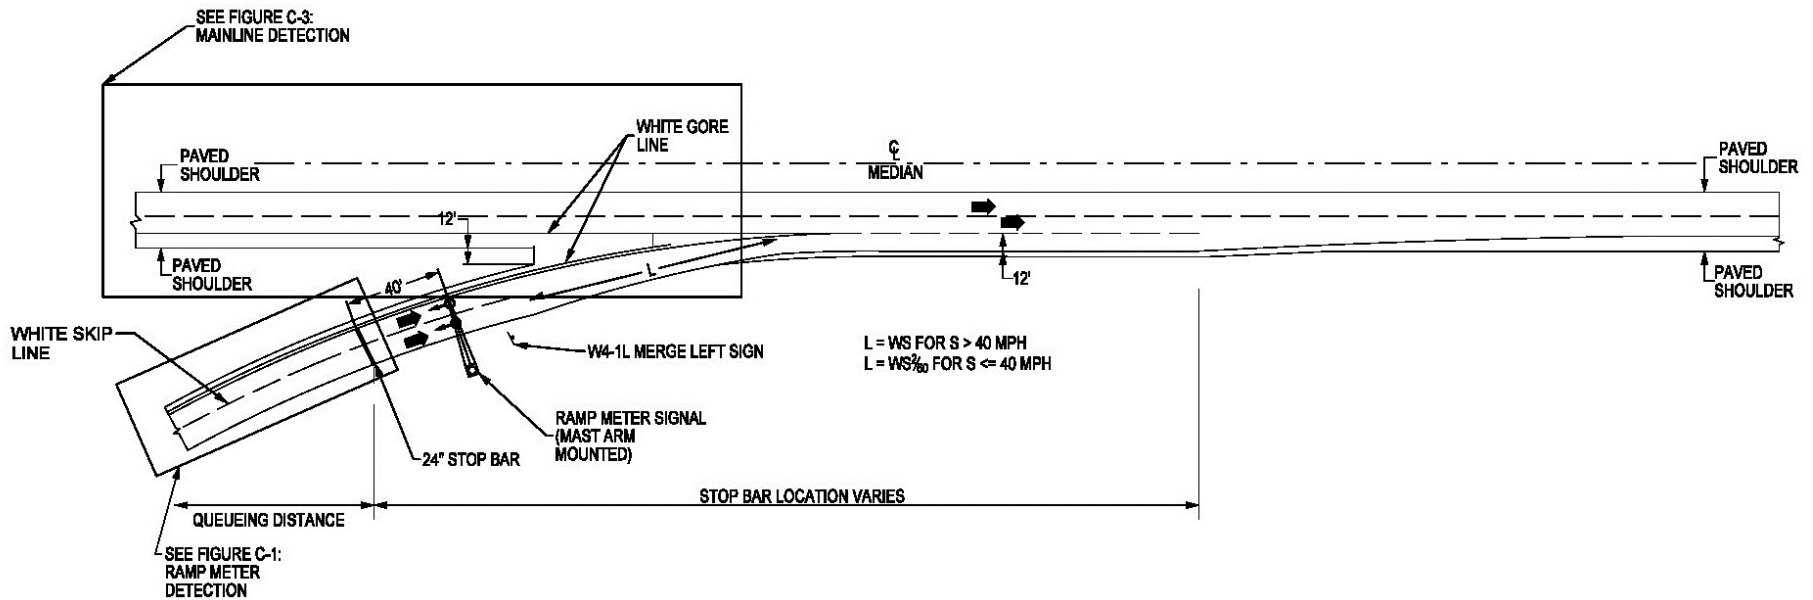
Single-Lane Ramp Meter with Transit Bypass Overview
